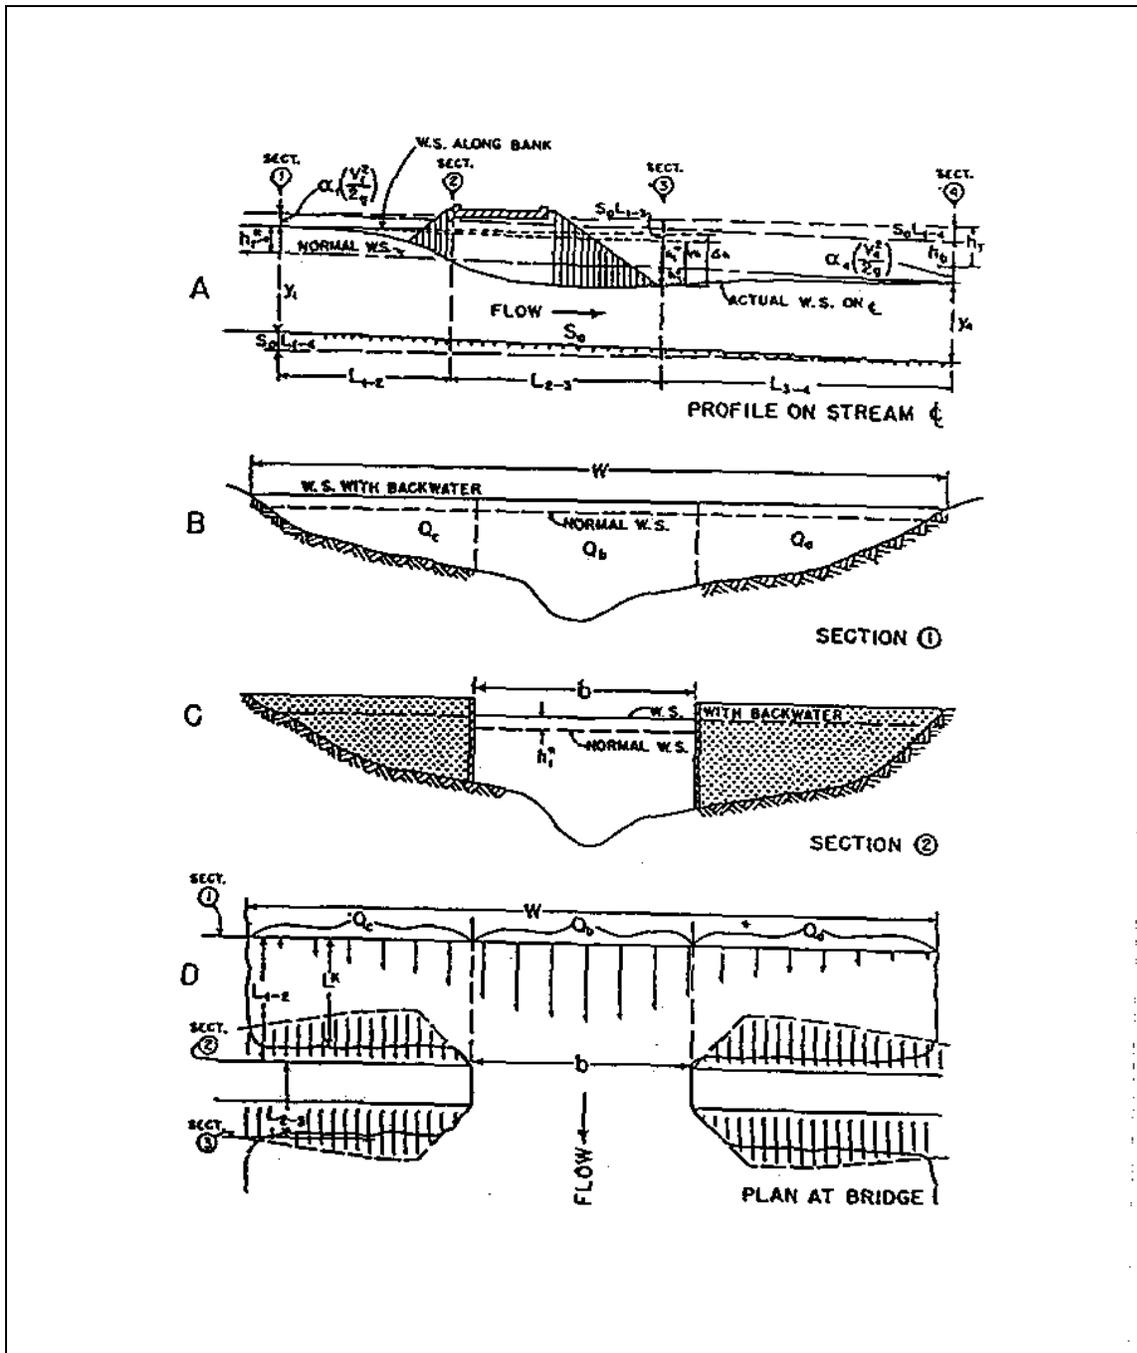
Stream profile and cross sections for normal bridge crossing, wingwall abutments
